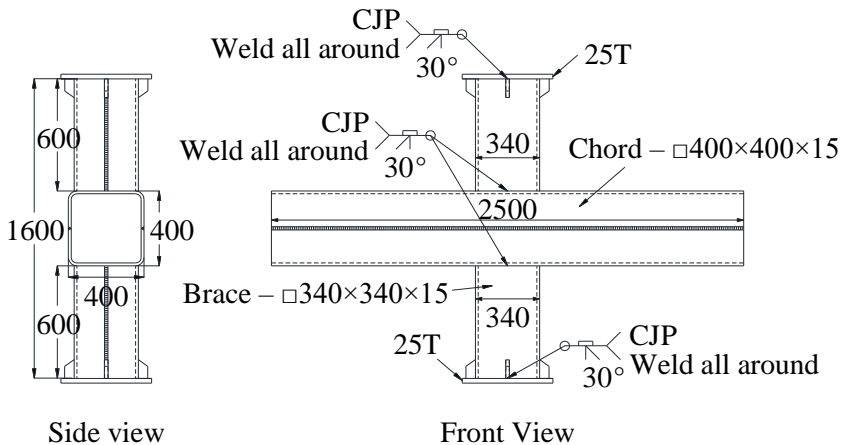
Drawing of the geometry of specimen #3 and specimen #4
